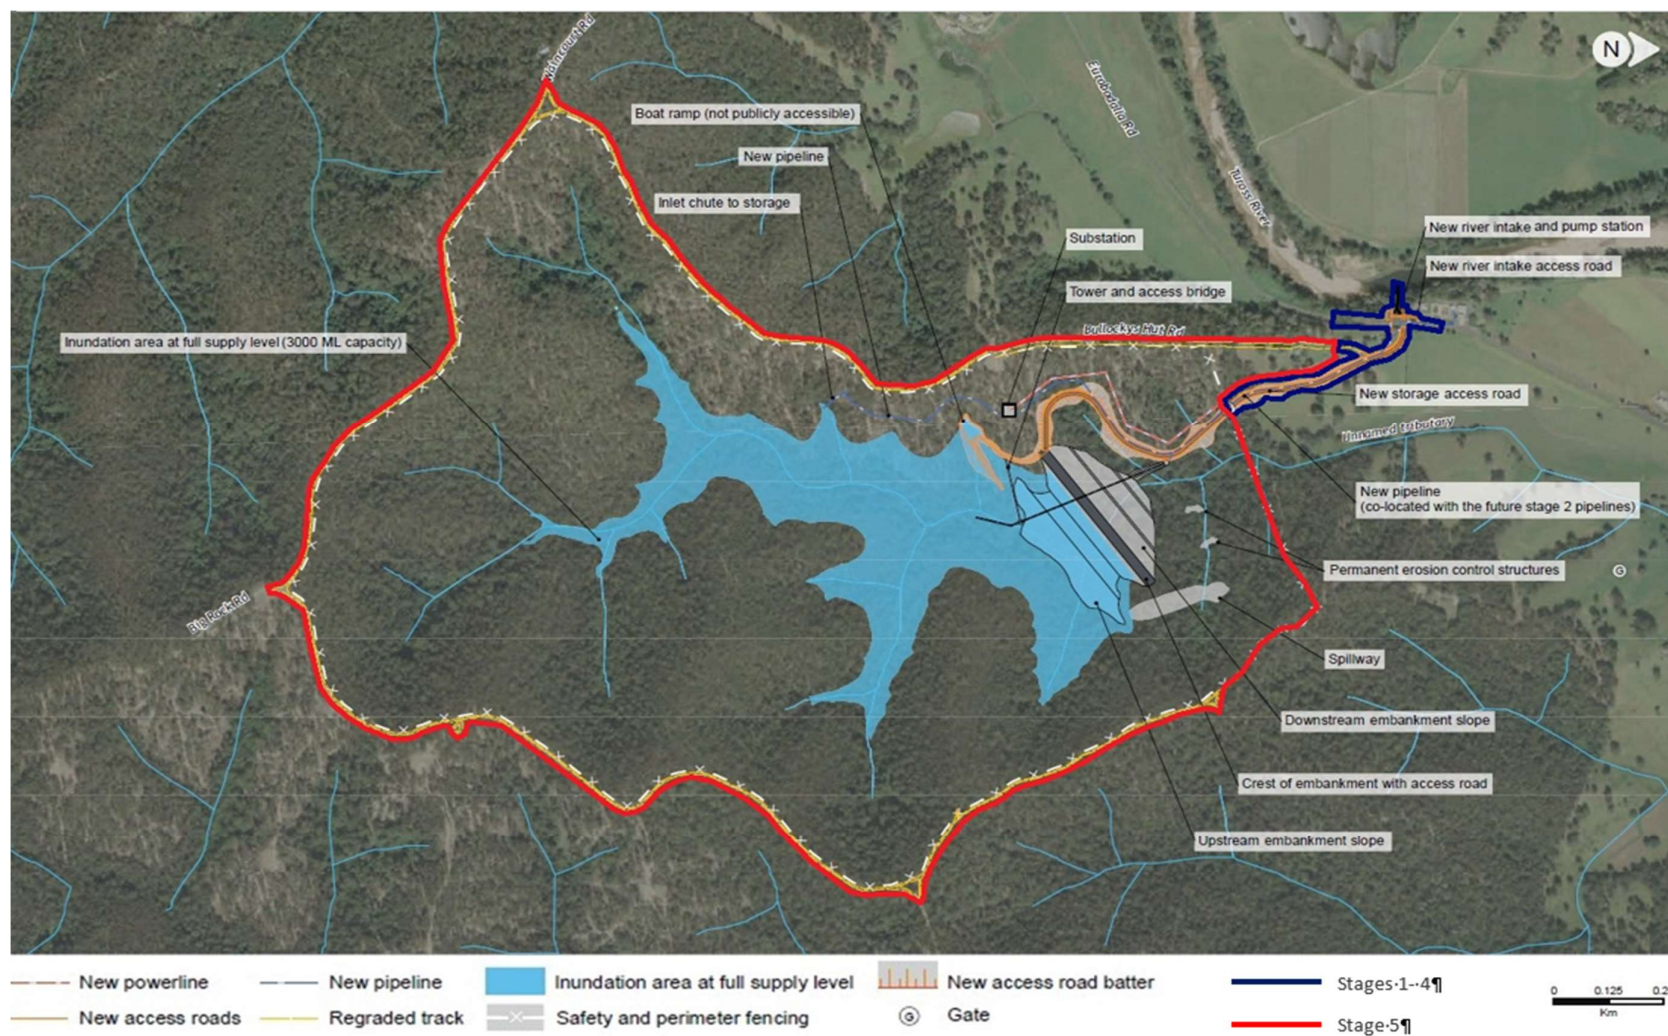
Project overview and scope of works covered by the plan (Stage 5)
